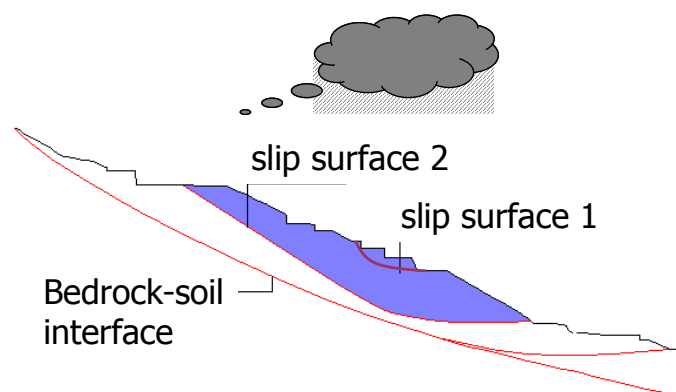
Development of shallow-seated failure or multiple failure zones in a slope
